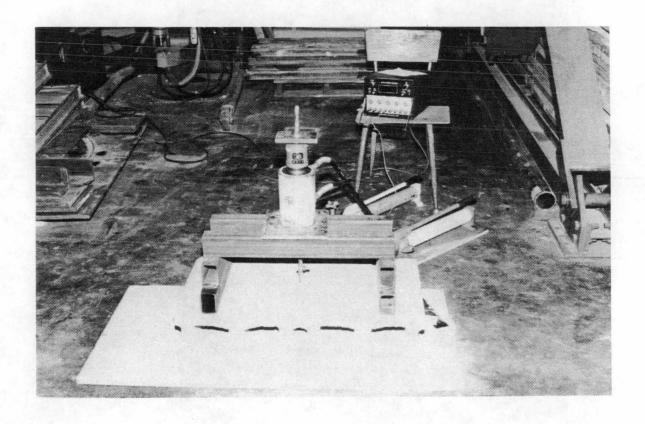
Testing Apparatus for Prisms with a Simplified Shear Connector
